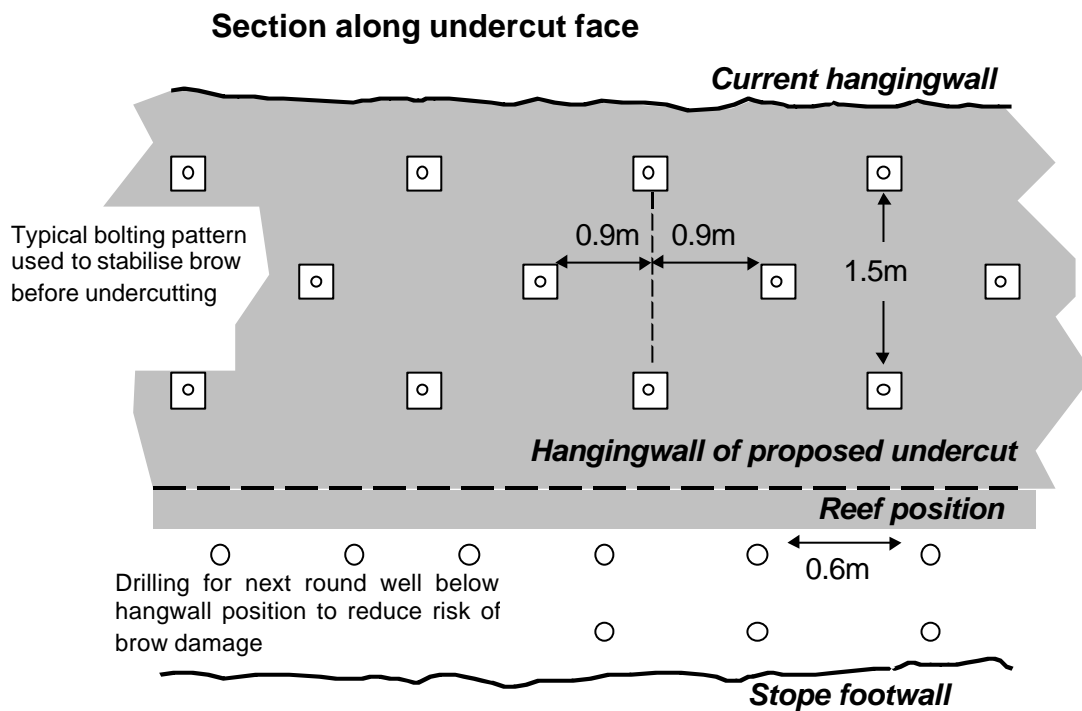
Undercutting employing roof bolts. (Note that pre-tensioned rope anchors & rapid yielding hydraulic props may also be used) (after Emere, 1977)
